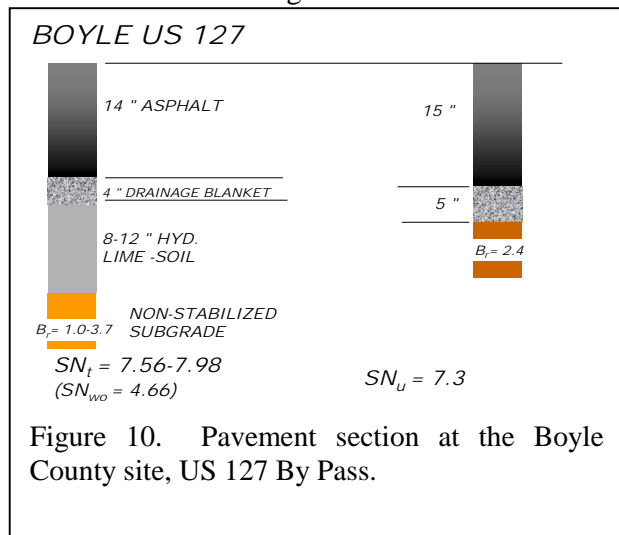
Pavement section at the Boyle County site, US 127 By Pass.
